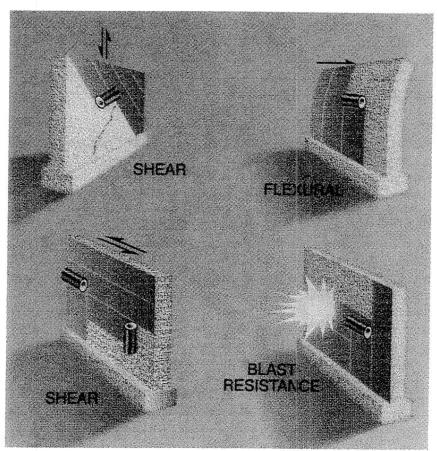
H STRUCTURAL RETROFIT OF CONCRETE BEARING WALLS
